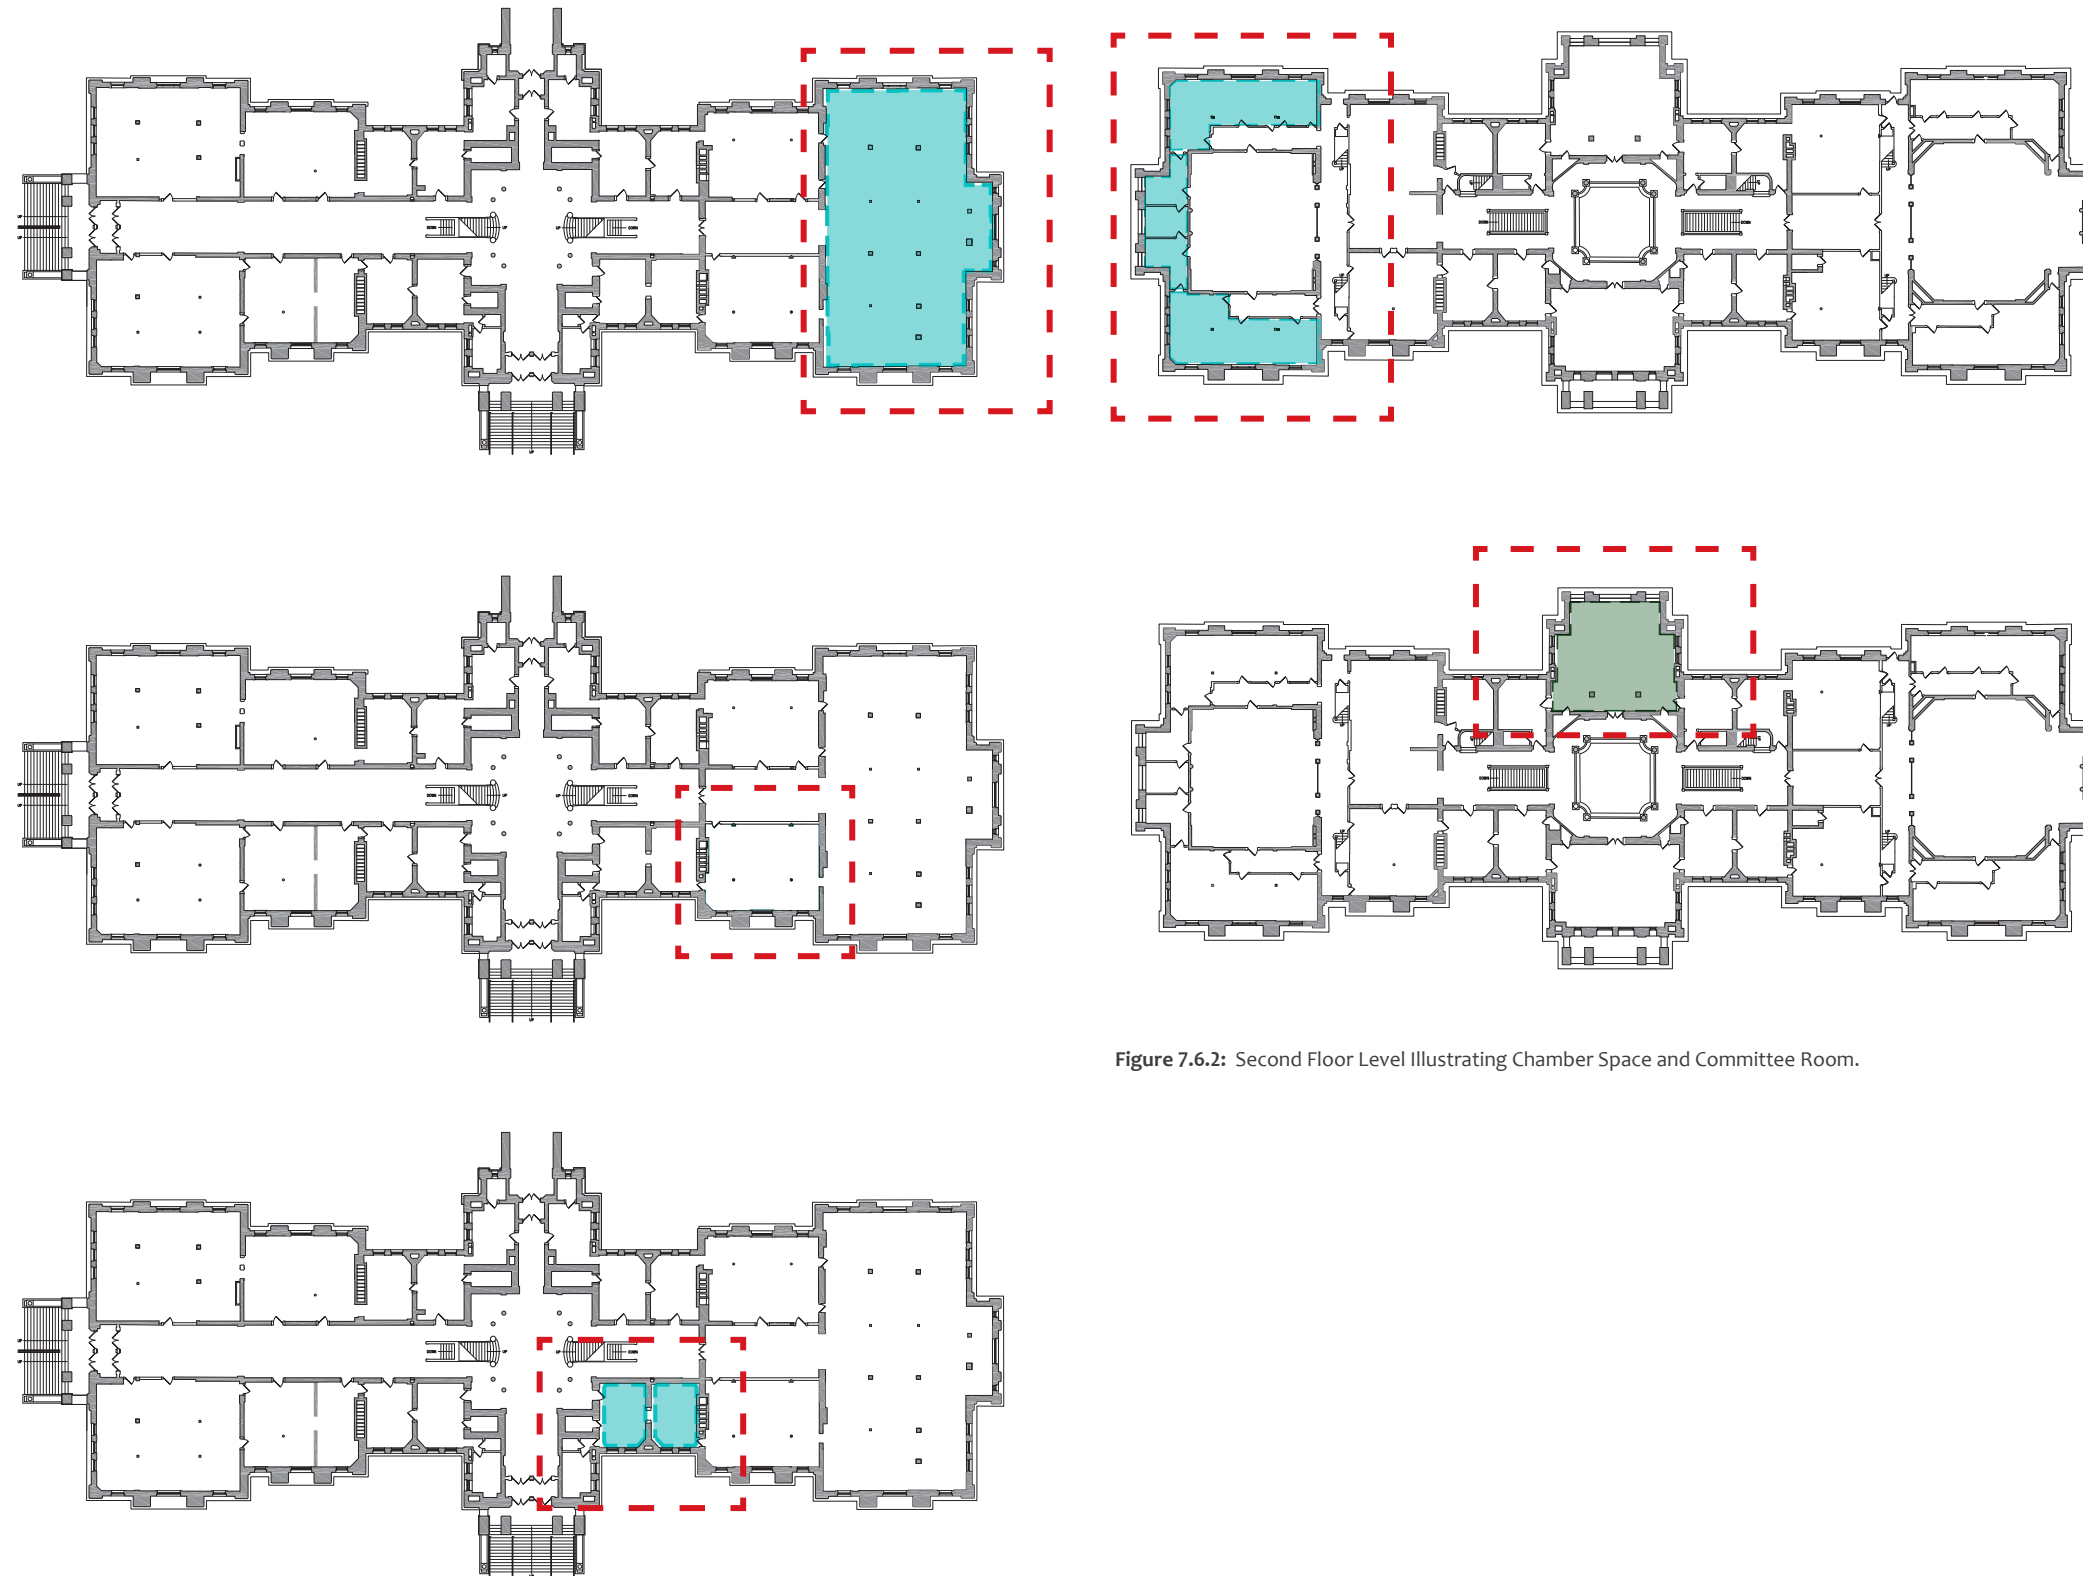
Second Floor Level Illustrating Chamber Space and Committee Room.
